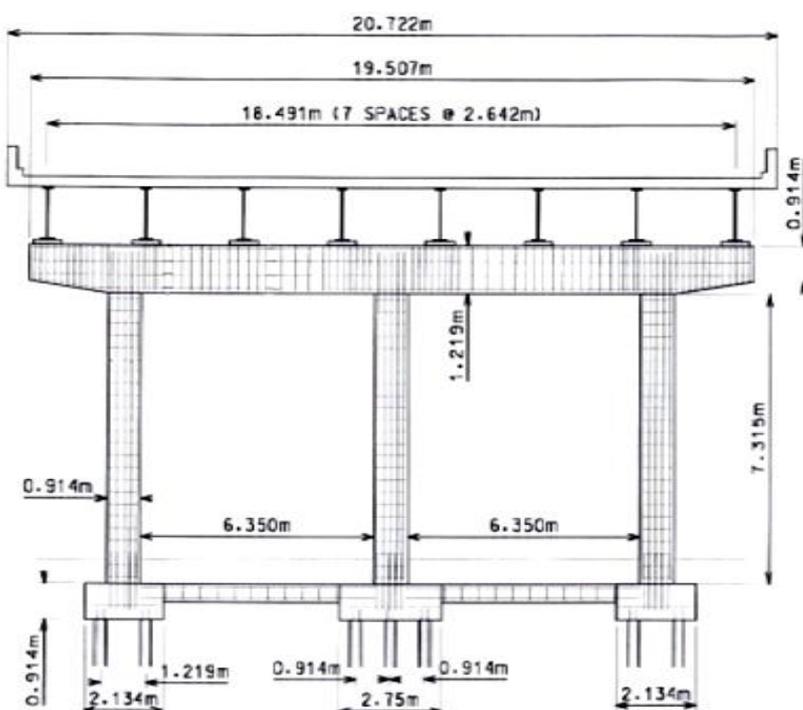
Bridge bent elevation. (Pantelides & Gergely 2002).
